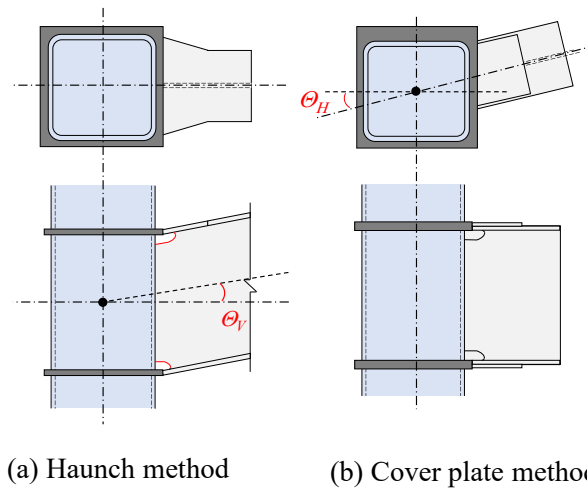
Reinforcement method for beam-ends with oblique angle
